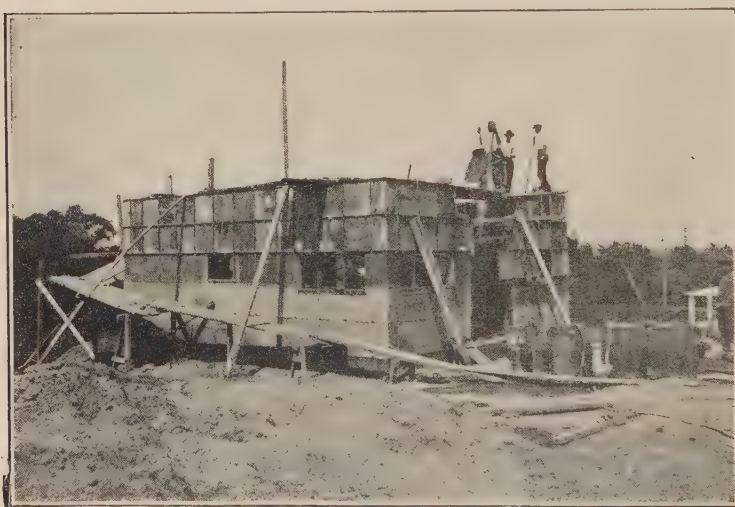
CONCRETE HOUSE IN COURSE OF CONSTRUCTION.
